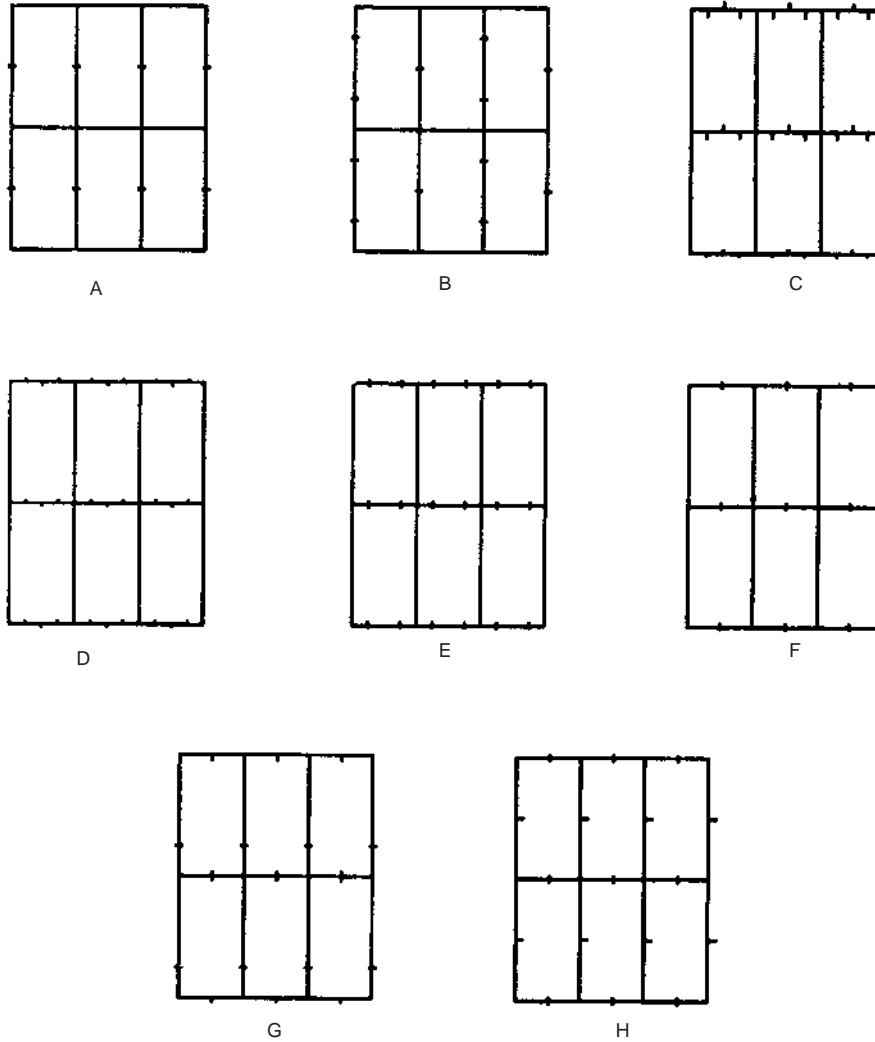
C : Typical Details of Cramps for R.C.C. Backing
